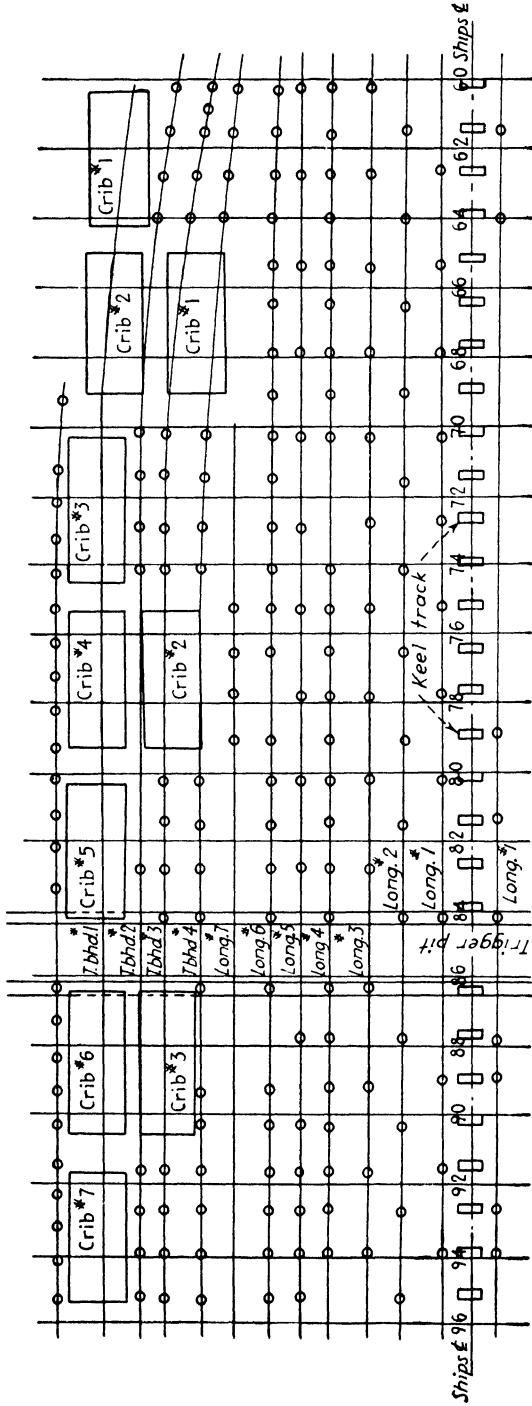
Arrangement of shoring through midships under an extremely heavy ship, together with keel track and bilge cribbing.
